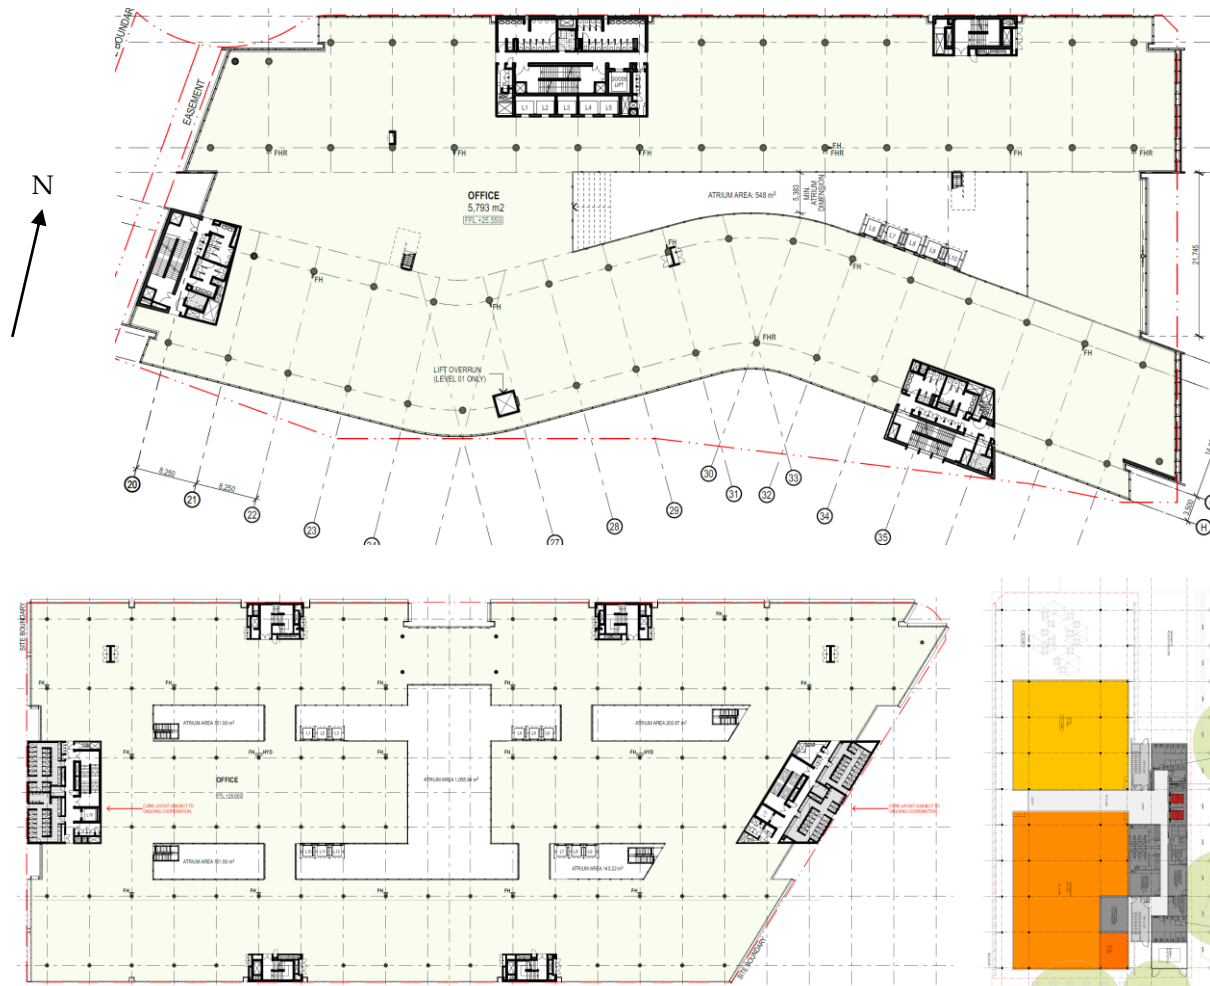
Plan view of Building 1 (T), Building 2 (BL) and Community Building (BR)
